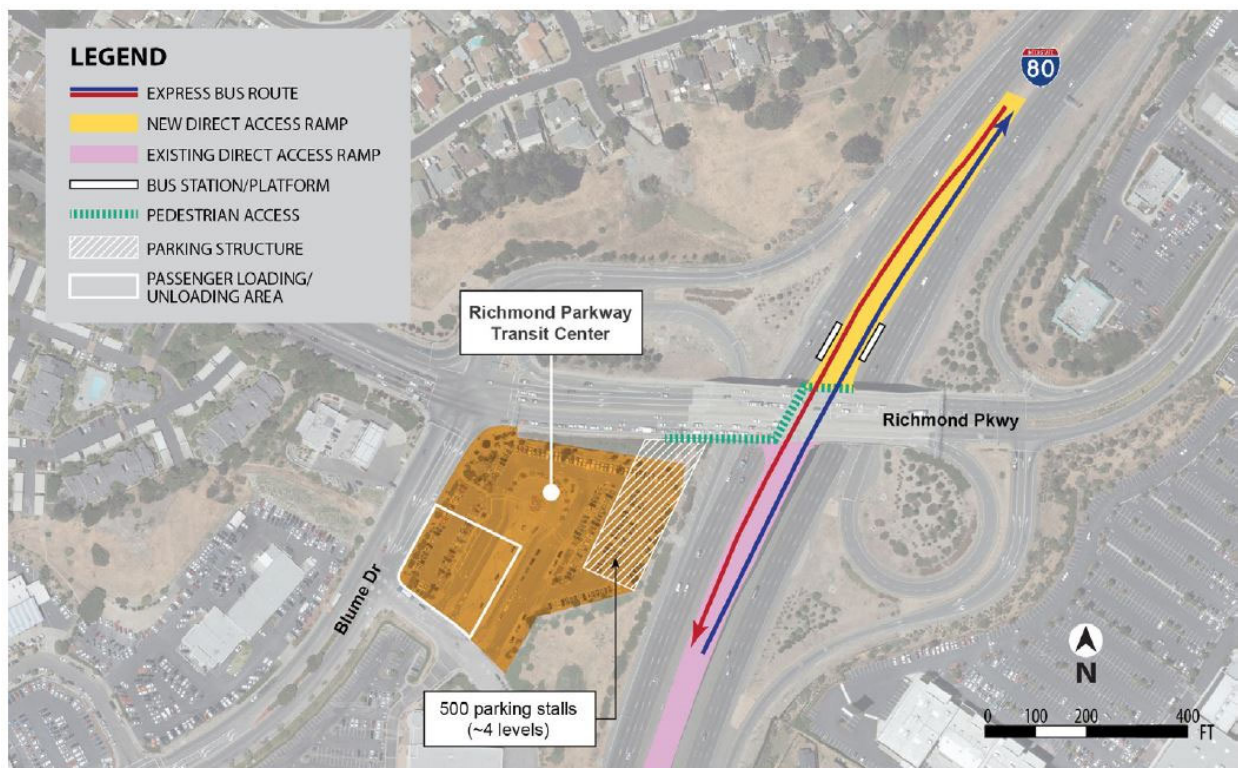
Richmond Parkway Transit Center Direct Access Ramps
